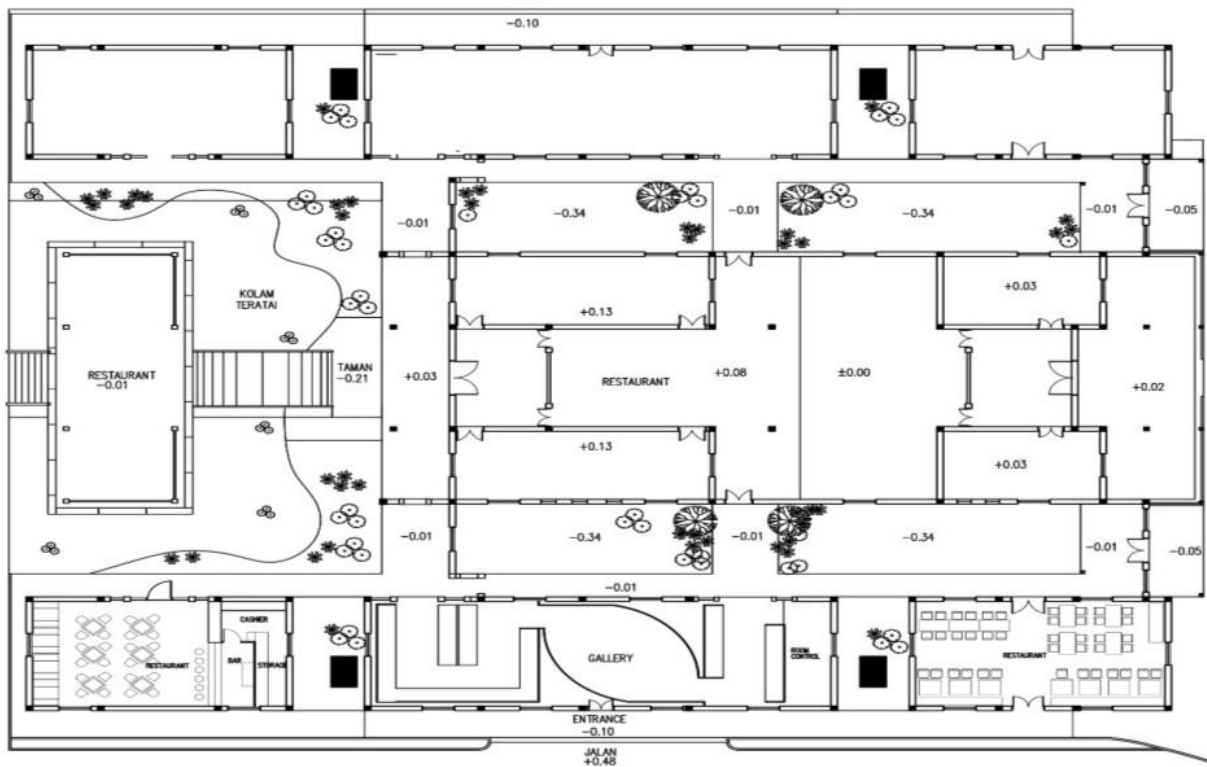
Candra Naya Floor Plan. (Source: Priyomarsonor, 2022)
